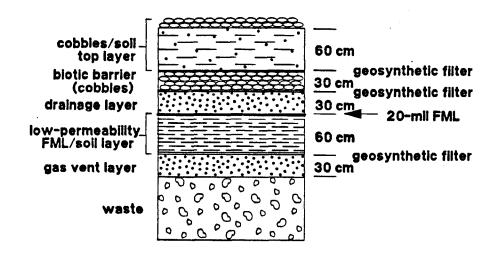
, Cross-section Schematic of a Full-RCRA Cap (Alternative 3D)
